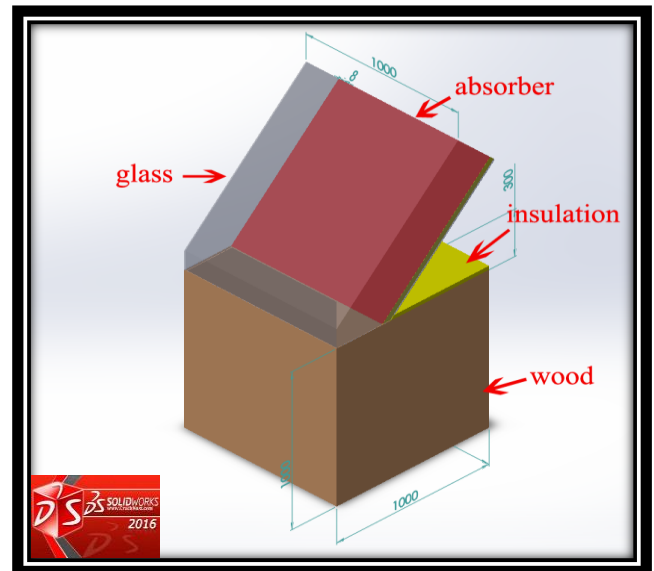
Roof solar chimney with inclination 45° (all dimensions in mm)
